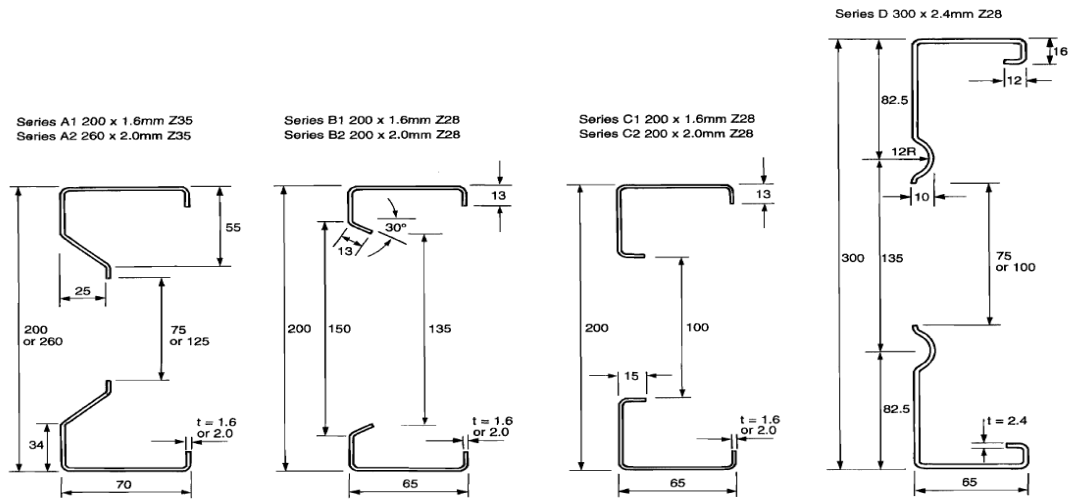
Typical cross-section of the specimens tested by Chung (1995a)
